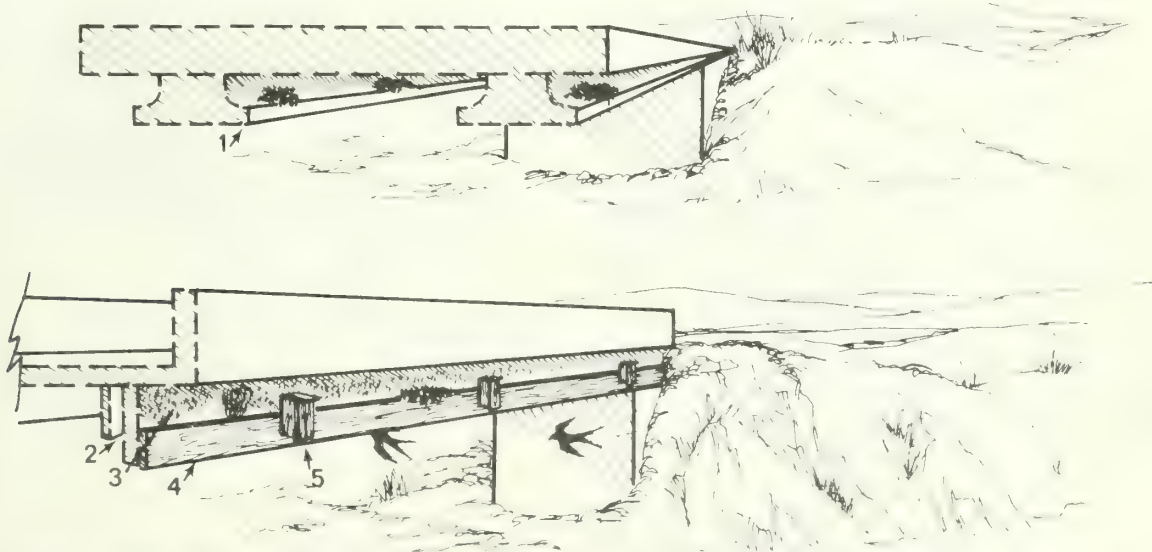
Concrete bridges can be designed to enhance their potential as wildlife habitat: (1) expanded beams for nest construction, (2) manmade crevice in which bats can roost and rear young, (3) roughened concrete to aid nest construction by some species of birds, (4) wooden plank to create a platform on which birds can nest, and (5) bird boxes to enhance use by a variety of birds.
